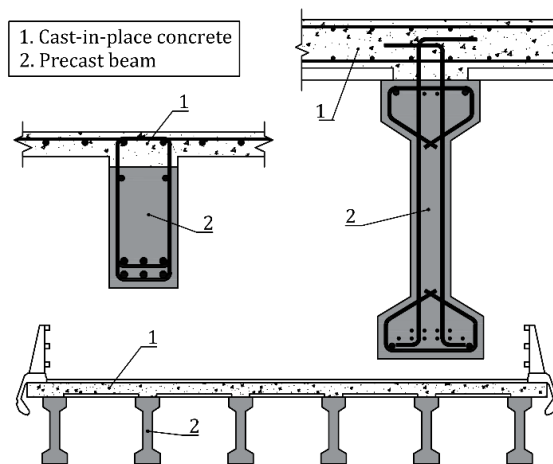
Examples of the cross-sections of precast beams with cast-in-place slabs frequently used in concrete composite beams decks.
